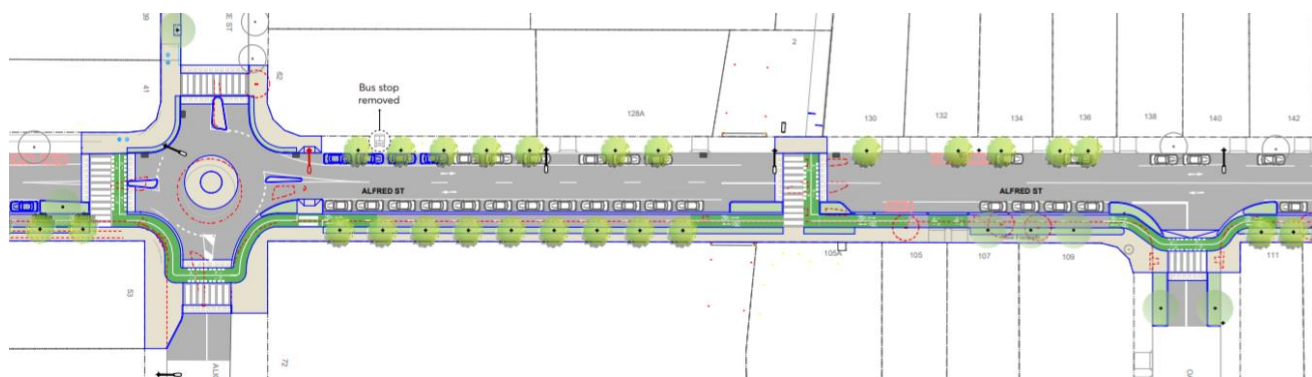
An extract from the plans for Alfred Street in Harris Park (Source: Parramatta Council)
